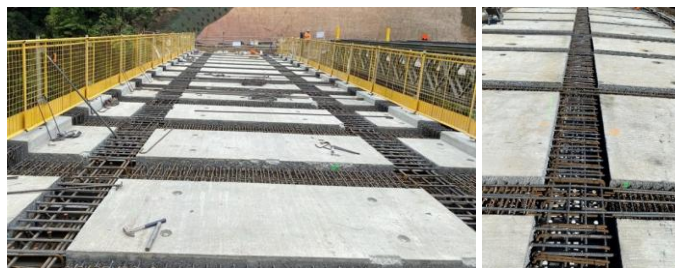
LHS – Precast panels placed on the No.4 Road Bridge project. RHS – Precast panels placed for the SH25A Taparahi Bridge project.
